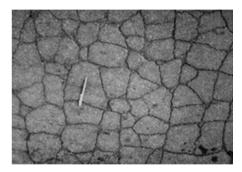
Example of asphalt pavement where reinforcement could provide a benefit
